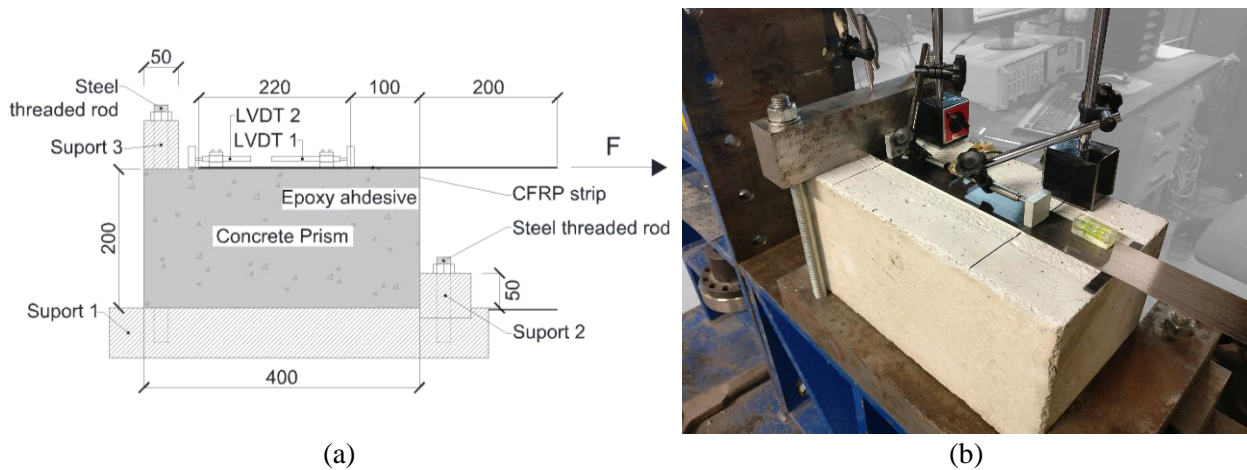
Pull-out shear test of bond EBR-CFRP to concrete: (a) specimen's geometry and test configuration and (b) photograph of the test. Note: All units in [mm].
